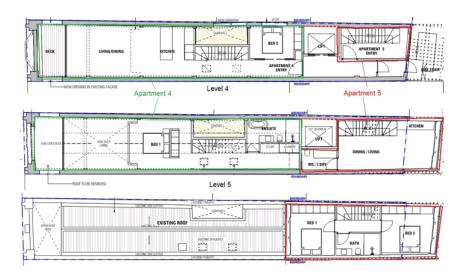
Annotated plan of Level 4 alterations to create 2 floors within and addition of level 6 for Apartments 4 and 6 (JAWS, 2020)
